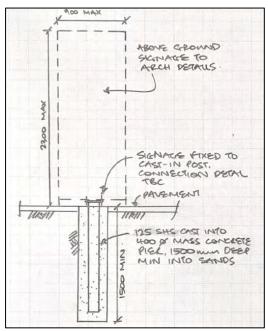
FR1 & FR2 sketch demonstrating foundation detail.
